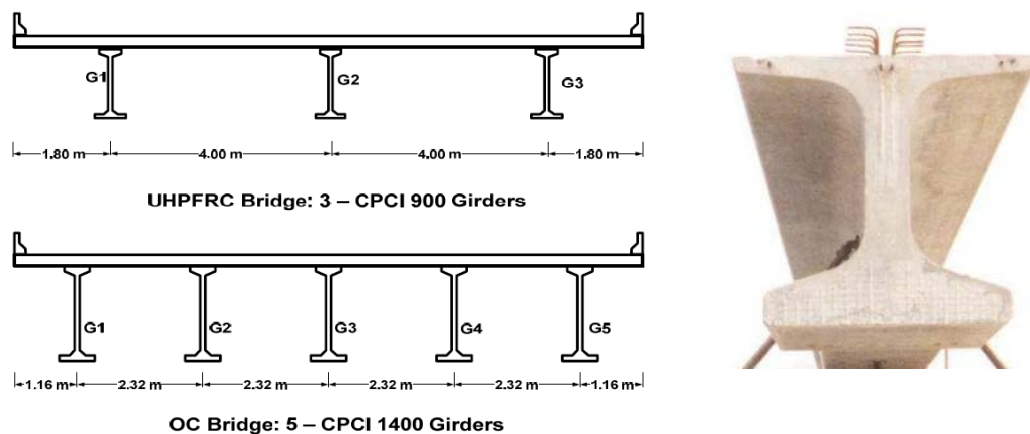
Comparison of UHPFRC an ordinary concrete precast prestressed girder bridges, NU I-girder [B01, p333]
